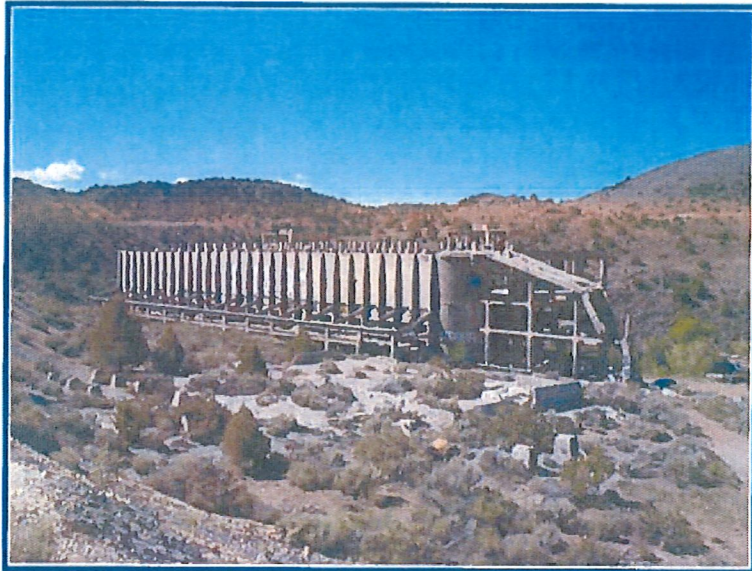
Building 8 – Substation slab with Building 3 in the Background
